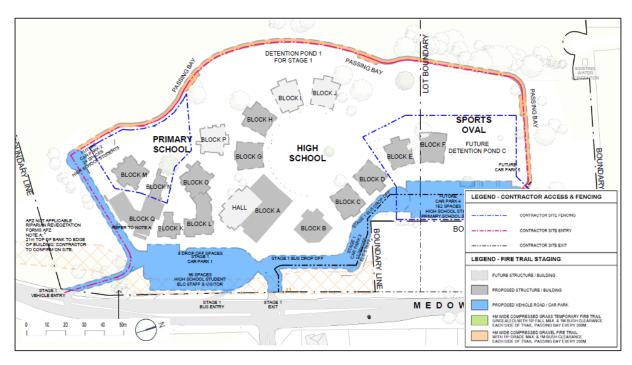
| Site Construction Arrangement – Stages 4a and 4b (source: SRtS 2019)
